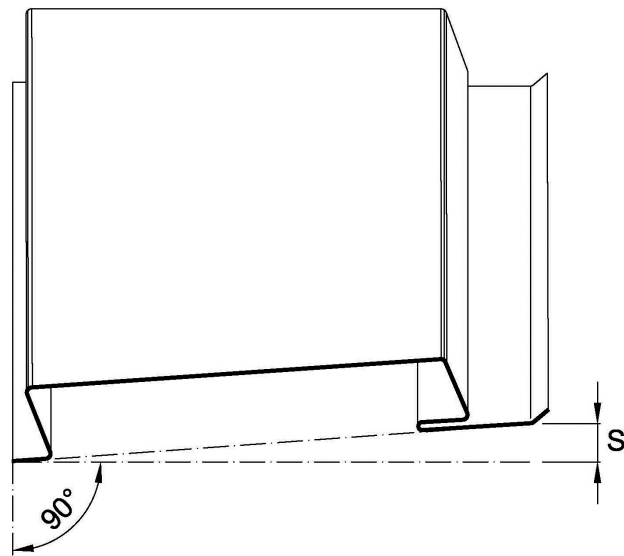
Cross section of sidings / façade profiles without shadow gap
